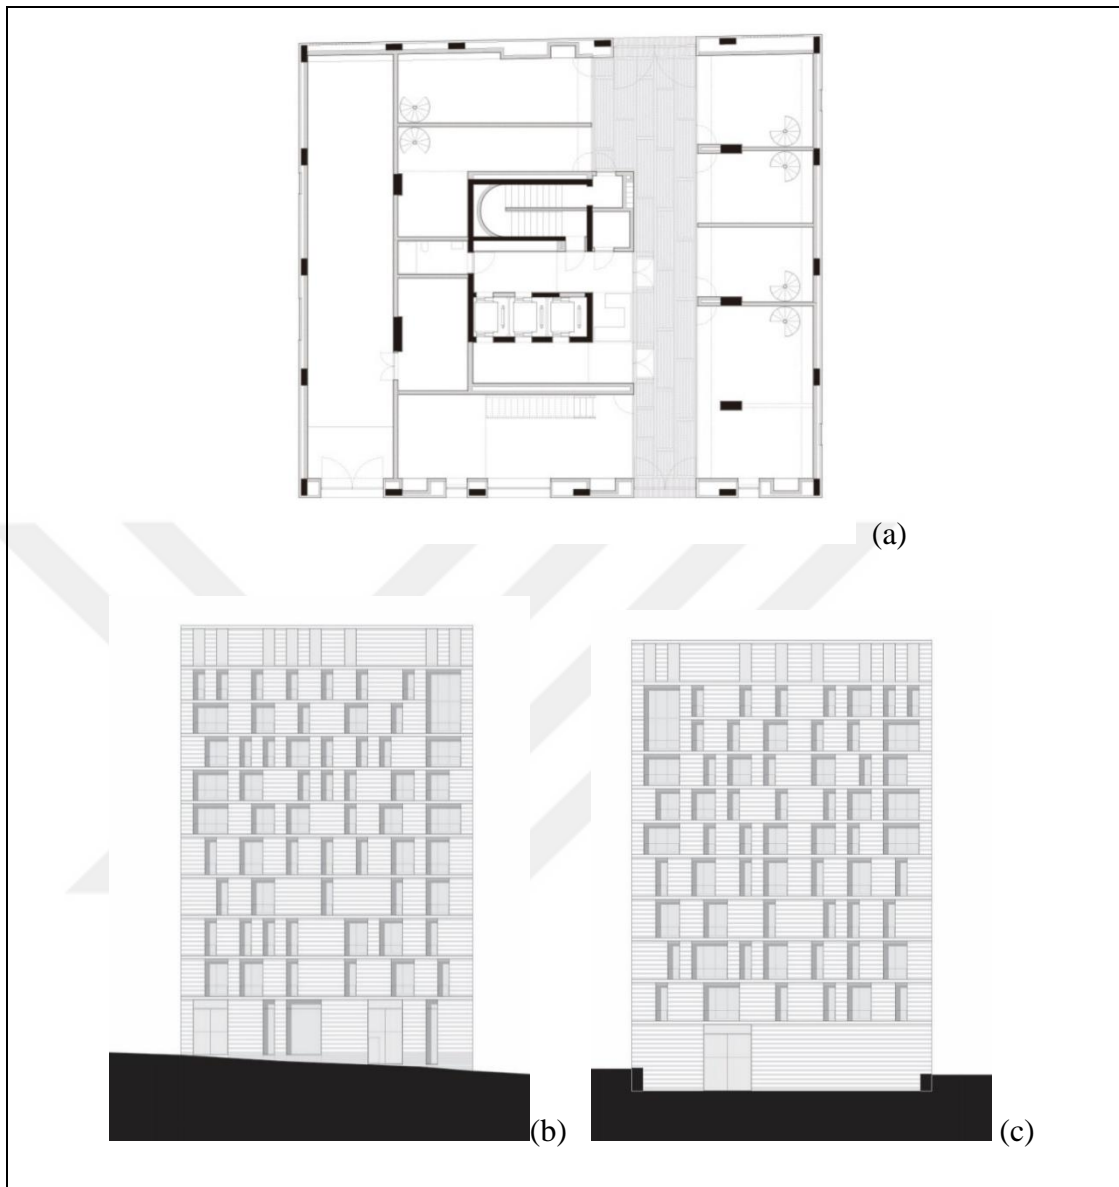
Lubango Center (a) Ground level plan (b) Main Facade (c) Back facade [112]
